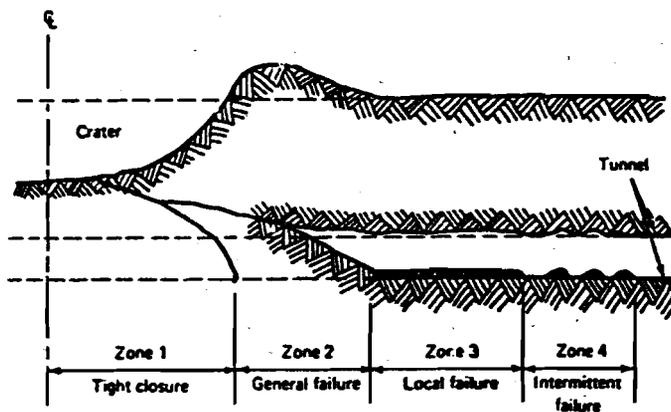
Zones of Damage Resulting from Underground Explosion Tests (6)
